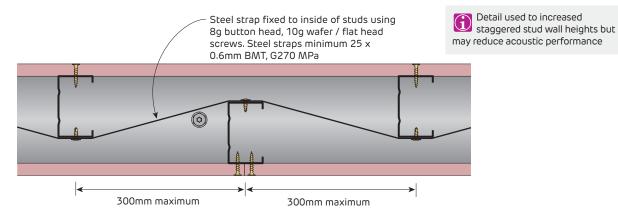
Strap Nogging for Staggered Stud Walls Plan
